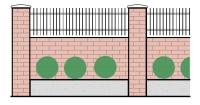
Semi-permeable fencing – brick pier and wall to 1200mm with integrated planter. Permeable infill panel above 1200mm
